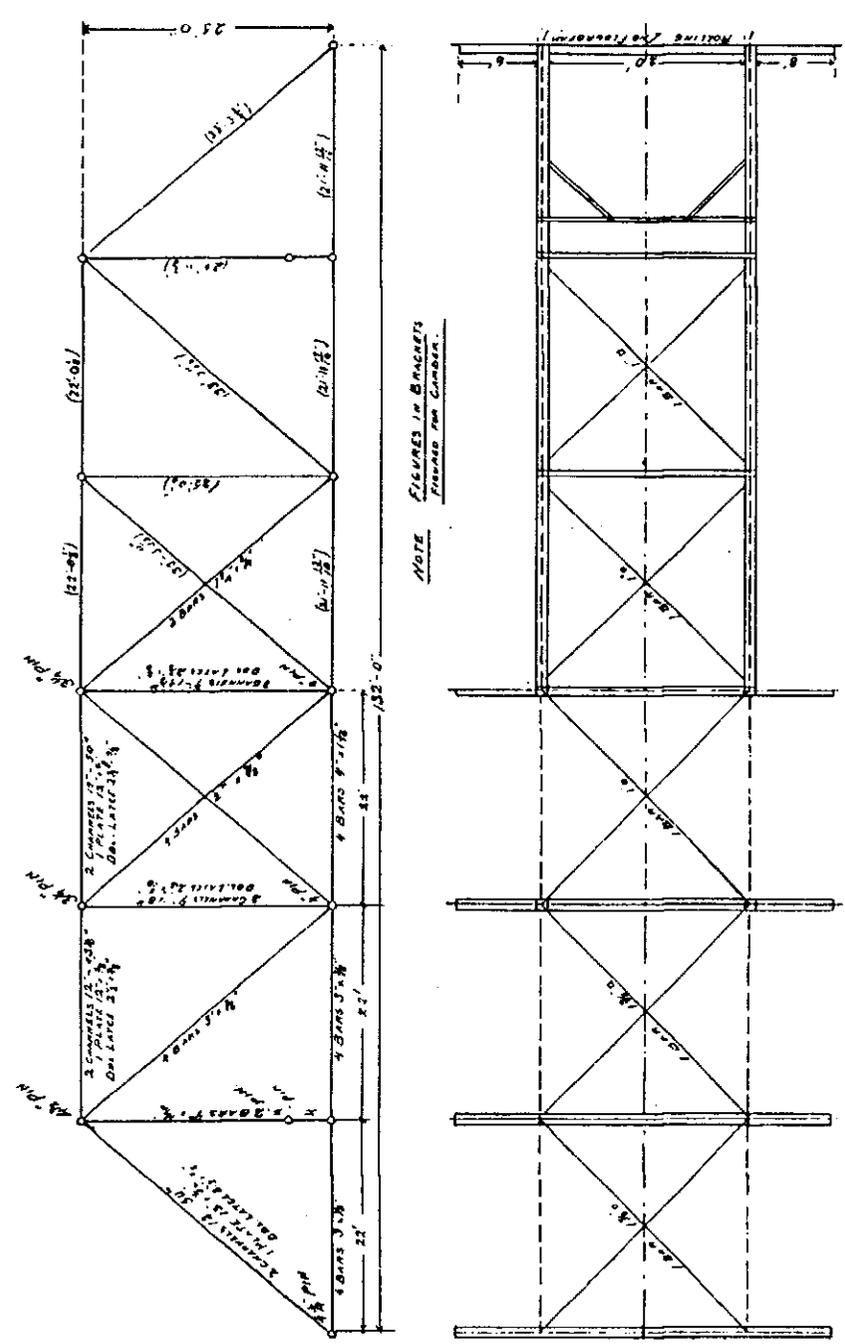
Plan and profile of bridge, from construction drawings by Chicago, Burlington and Quincy Railroad, 1886. Original drawings located at Galesburg, Illinois, Office of Burlington Northern Railroad.
